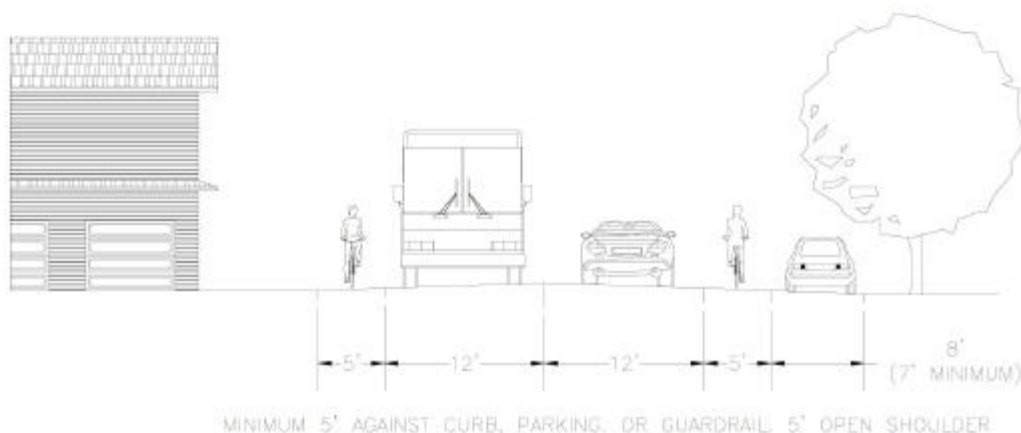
C shows a Bicycle Lane facility. This type of bikeway should be used in applications, which are located in urban areas with substantial demand and on-street parking. Bike lanes should always be well marked and signed to draw attention to their use by pedestrians and cyclists. Pavement markings and signage should meet the minimum requirements established by the MUTCD (current edition). The minimum width for bike lanes is 4 or 5 feet from the face of curb or guard rail with a travel lane of a minimum width of 12 feet. If on-street parking is permitted, the lanes must be placed between the travel lane and the parking area. An example of an application for this type of bike lane would be the proposed Boyer Avenue widened shoulder pathway northerly from East Mountain View to Schweitzer Cutoff Road. This roadway is currently designated as a major collector street.
